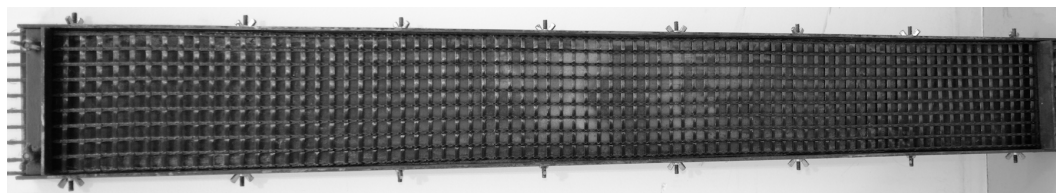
Steel formwork with textile. Used to produce 1000mm long test specimens.
